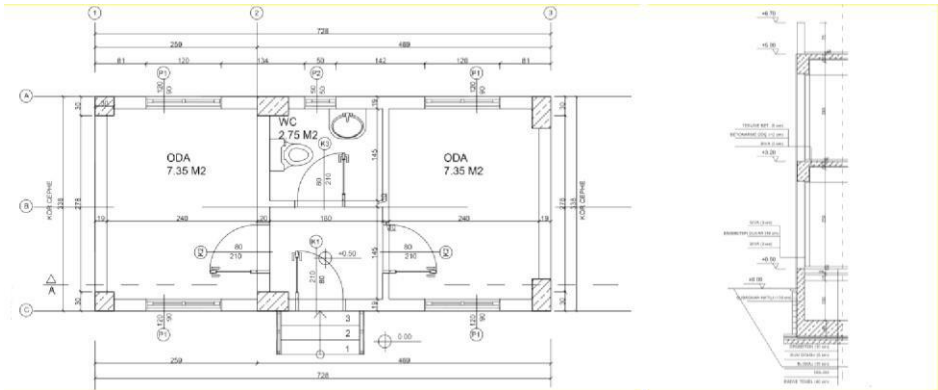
The Internship House Project Reinforced Concrete System Plan and Section
